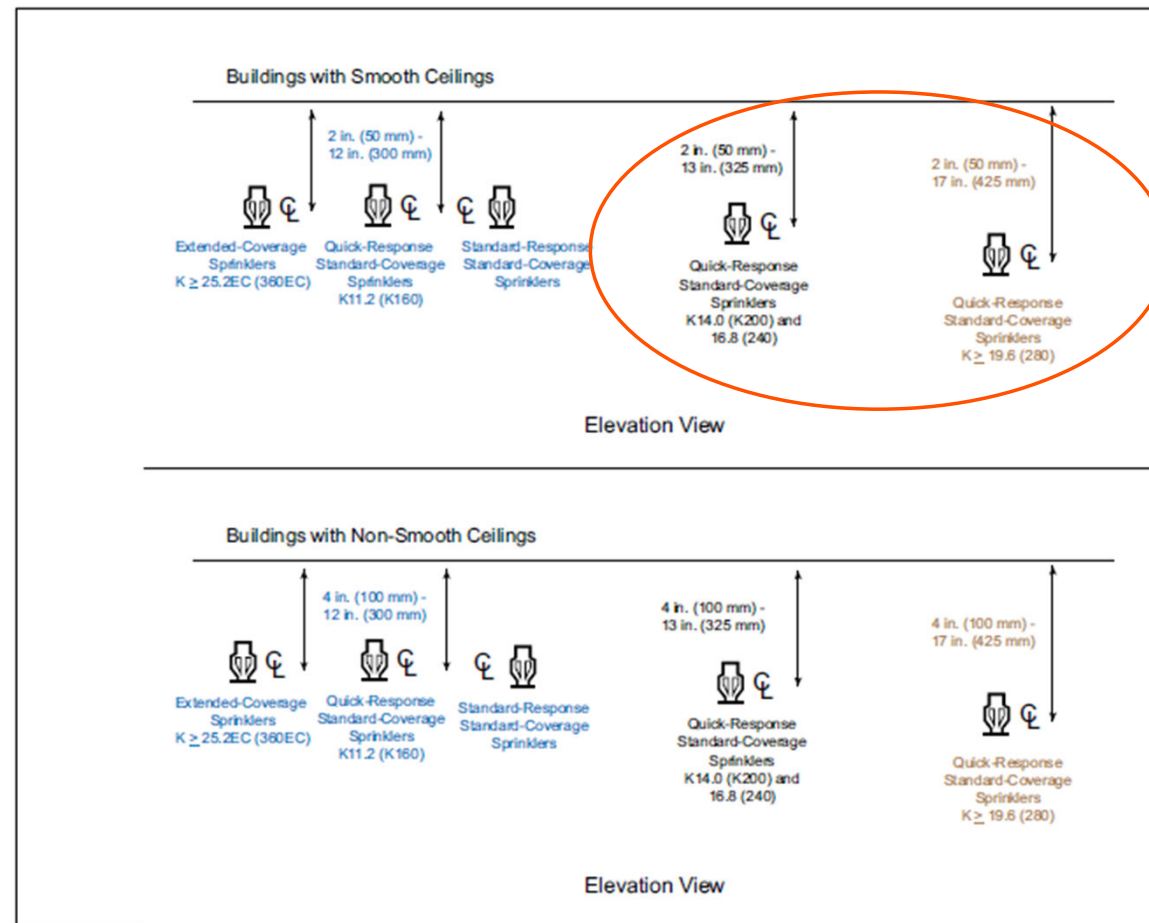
Vertical location of Storage sprinklers under unobstructed ceiling construction for various ceiling heights
